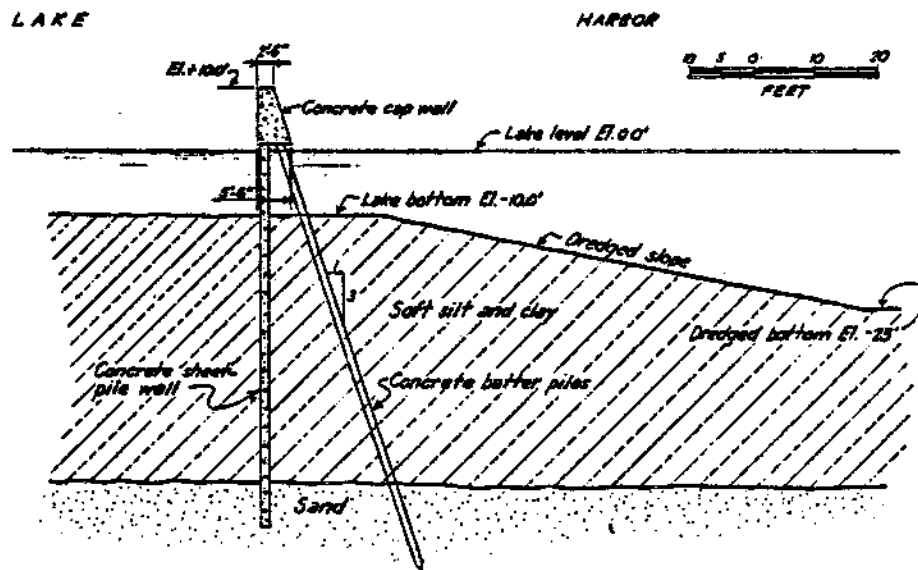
Concrete Sheet Pile Breakwater (Quinn, 1972,
